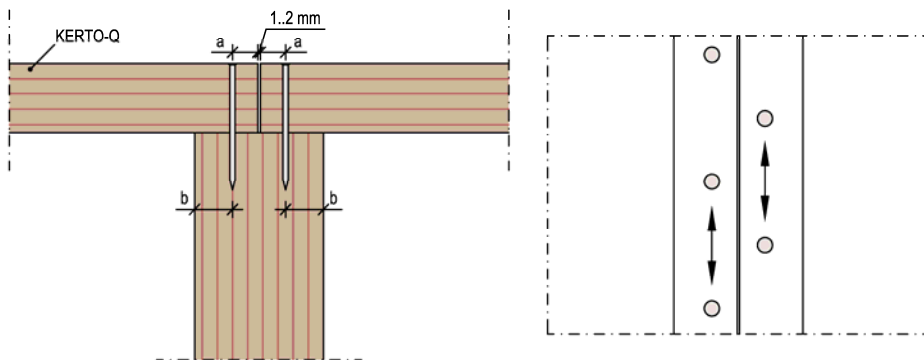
Panel joint on wooden construction, for minimum spacing see chapter 10.1.1.
